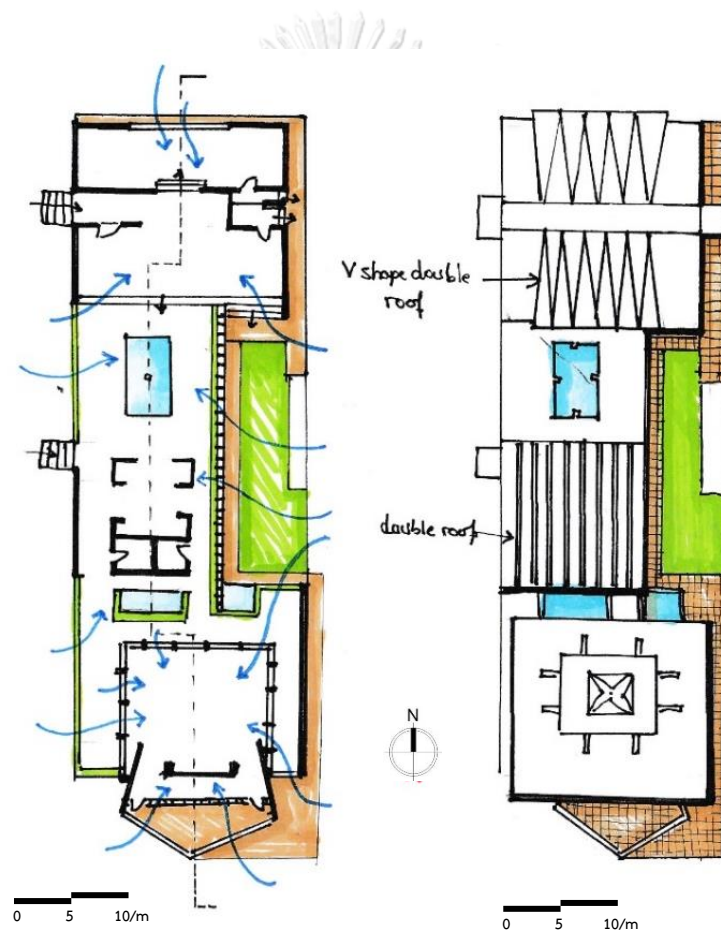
52 Diagram drawing analysis of the building's layout, designed with a central courtyard, a rectangular pool serving as drainage for collecting rainwater, using a passive design technique for cooling the building
